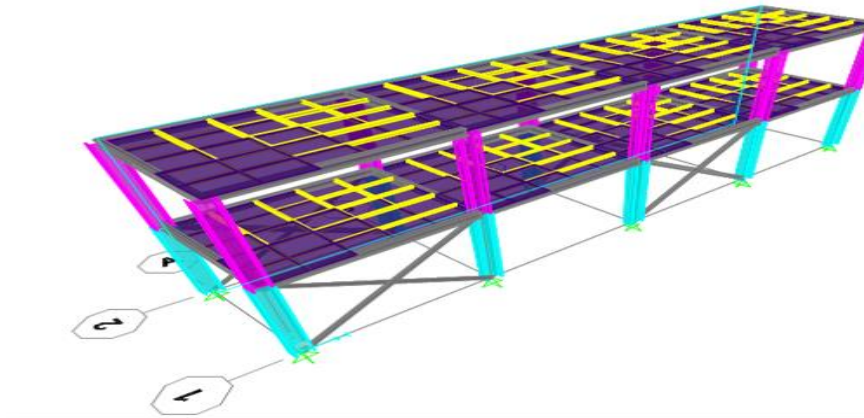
Reinforced structure where floors are bending and columns are supported laterall
